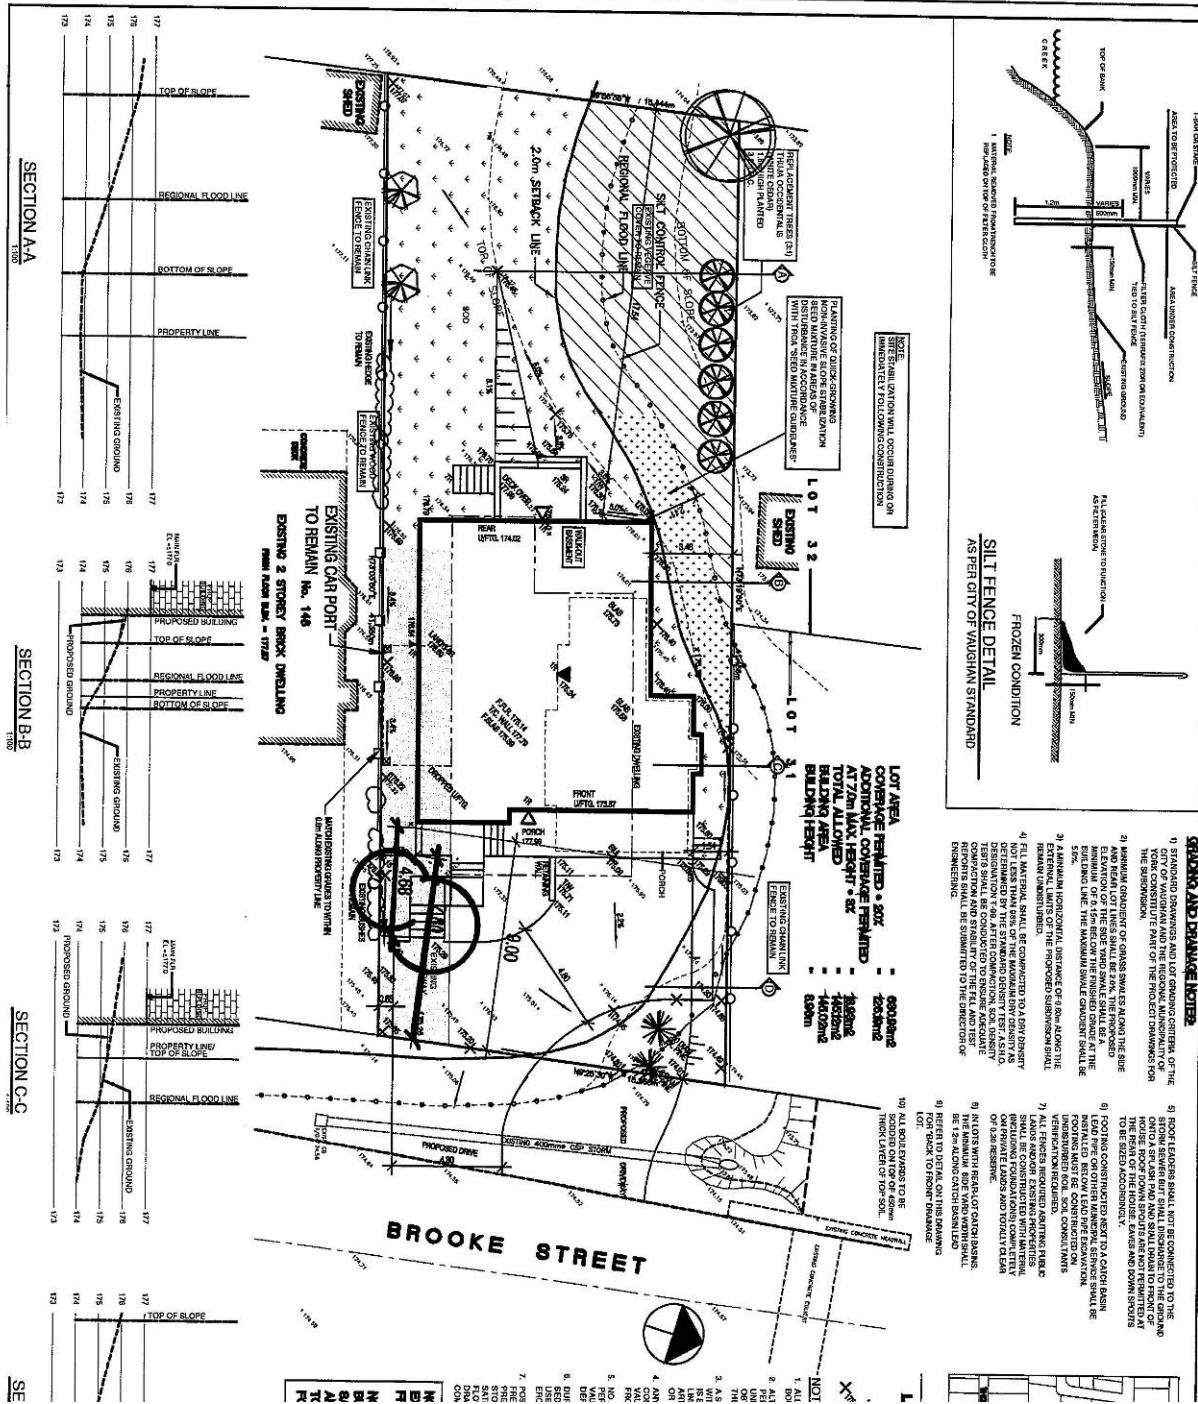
Site plan drawing submitted by applicant with identified variances to be considered by the Committee of Adjustment.
